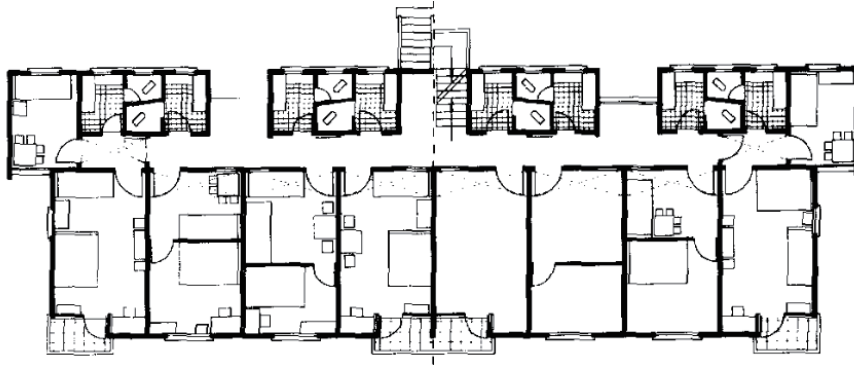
Plan of a residential building in the Wenchong Shipyard, Guangdong province
